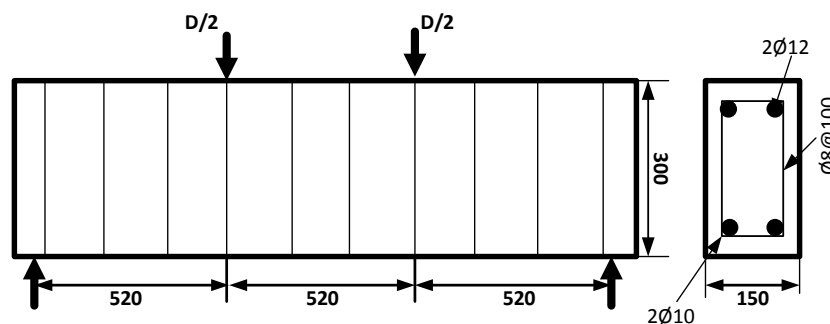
Geometry details and reinforcement and load procedure of the tested beams (mm)
